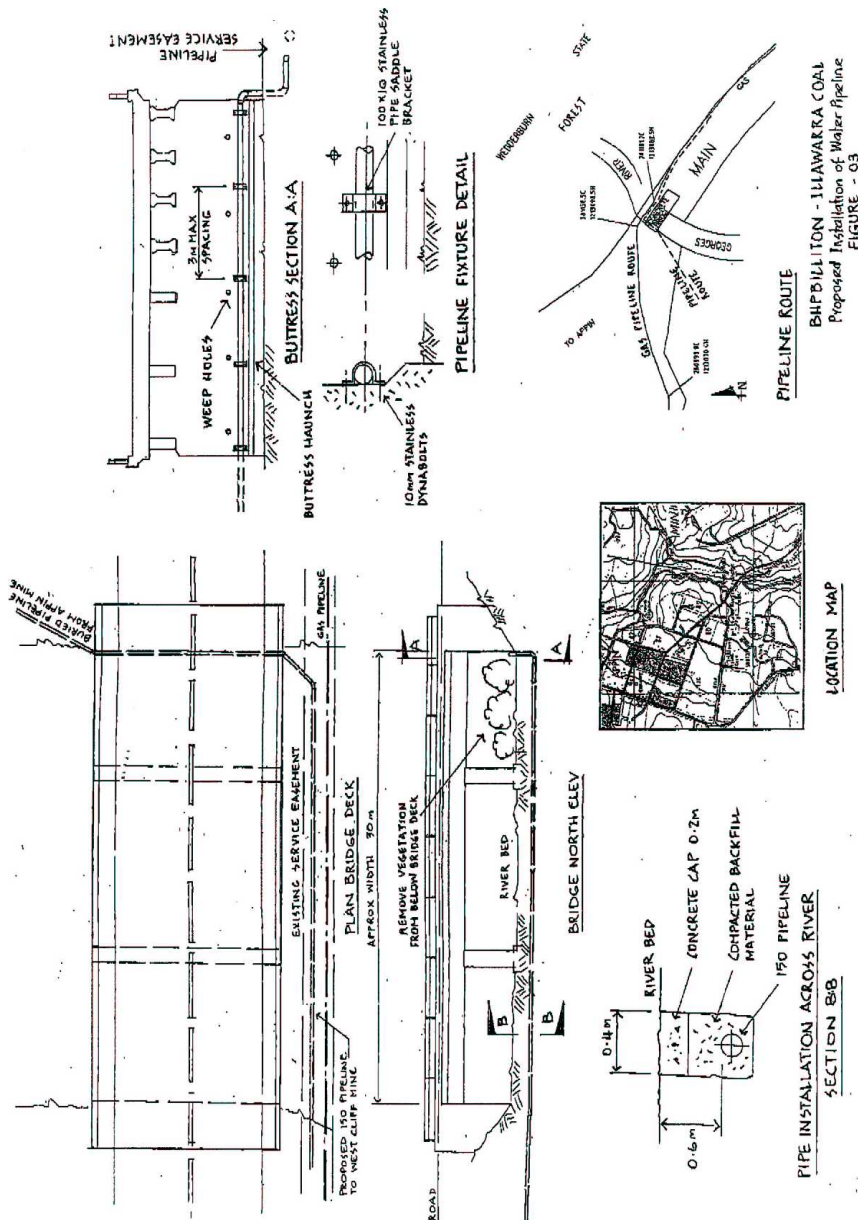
Pipeline construction methods at the Kings Falls Bridge (source: Olsen Environmental Consulting)
